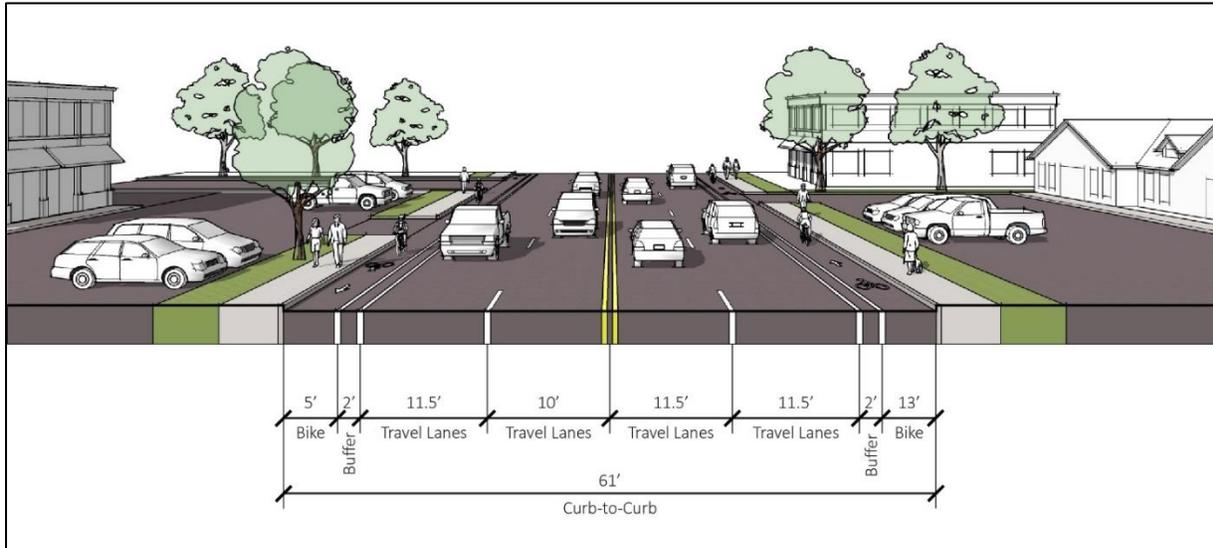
Existing River Road (Chemawa Road to Southern Study Area Limits)
